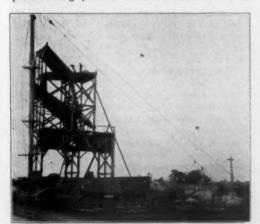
GENERAL VIEW OF CABLEWAY EXCAVATOR AND SCREENING PLANT.
